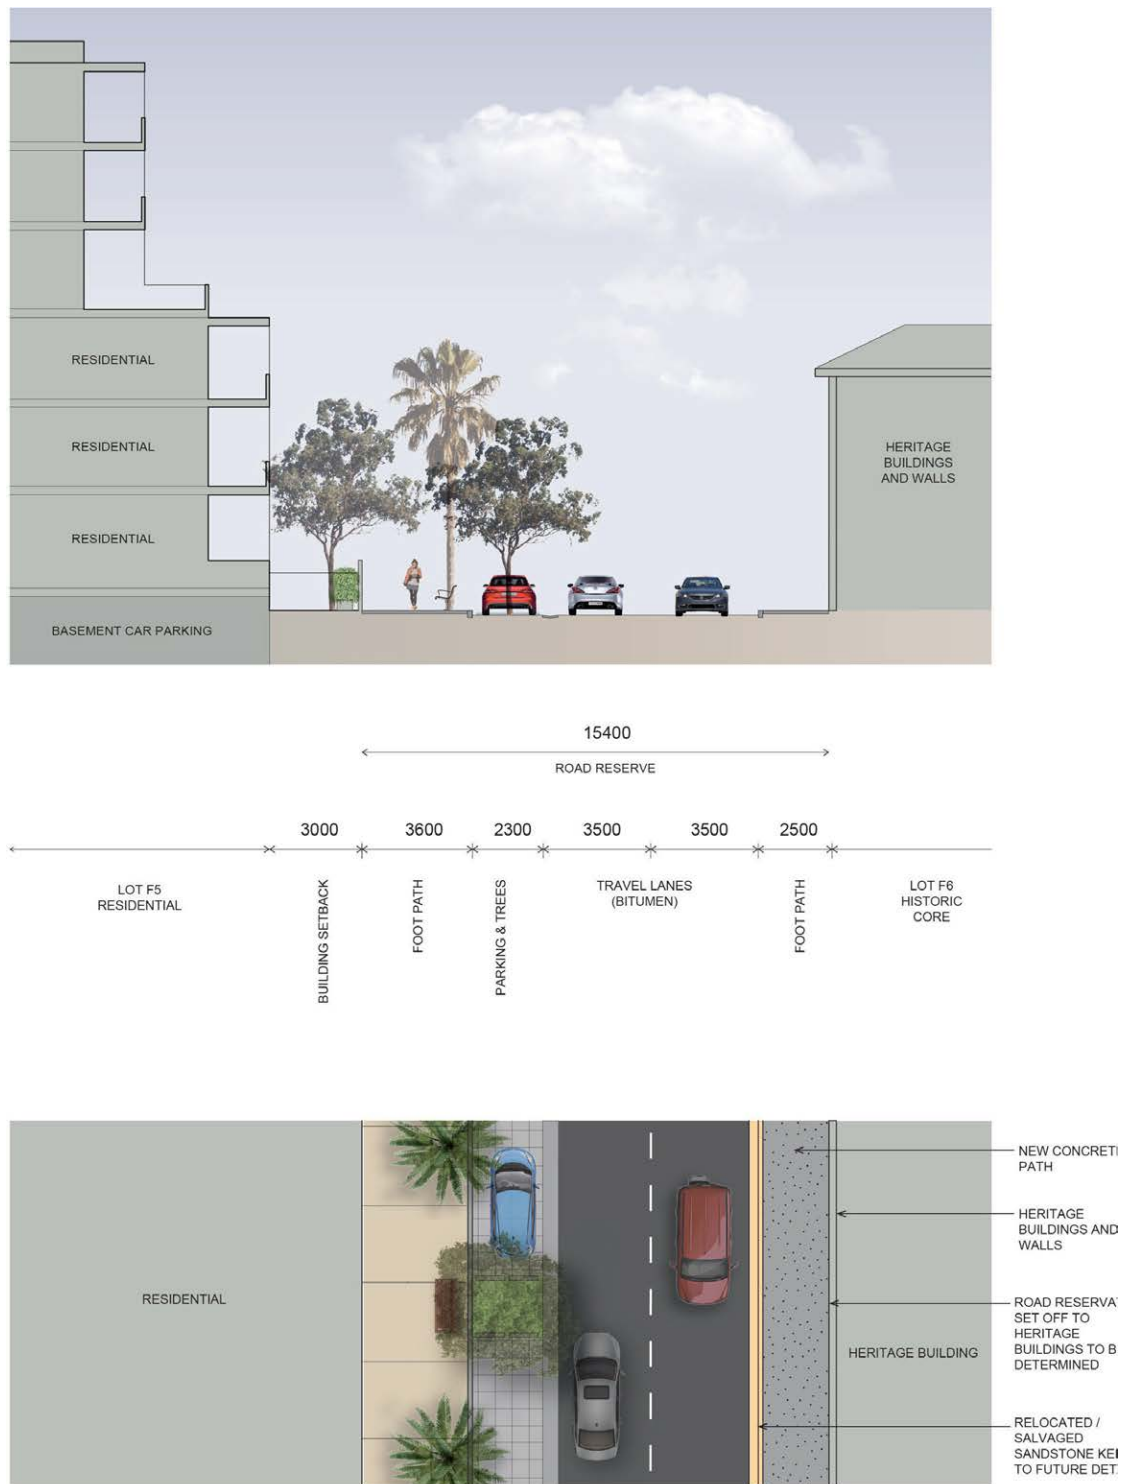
Typical street section 4 – River Road
